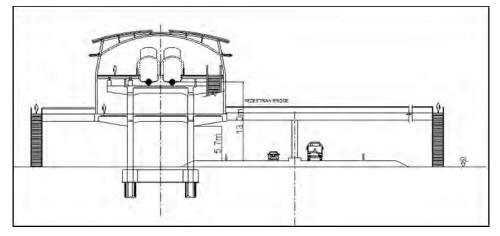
Control Point in Parallel Section with Access Control Toll Road
